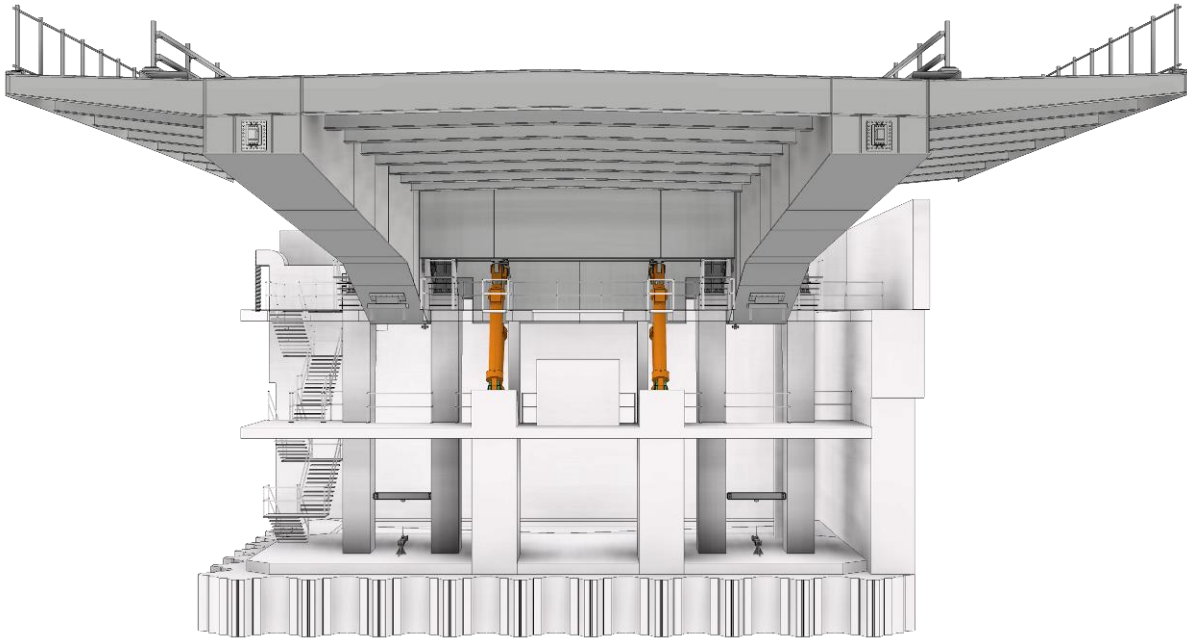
Movable Span Rendering with front wall of bascule pier removed. Note the twin box girder configuration and trunnion columns under each of four trunnion bearings, one either side of each box girder
